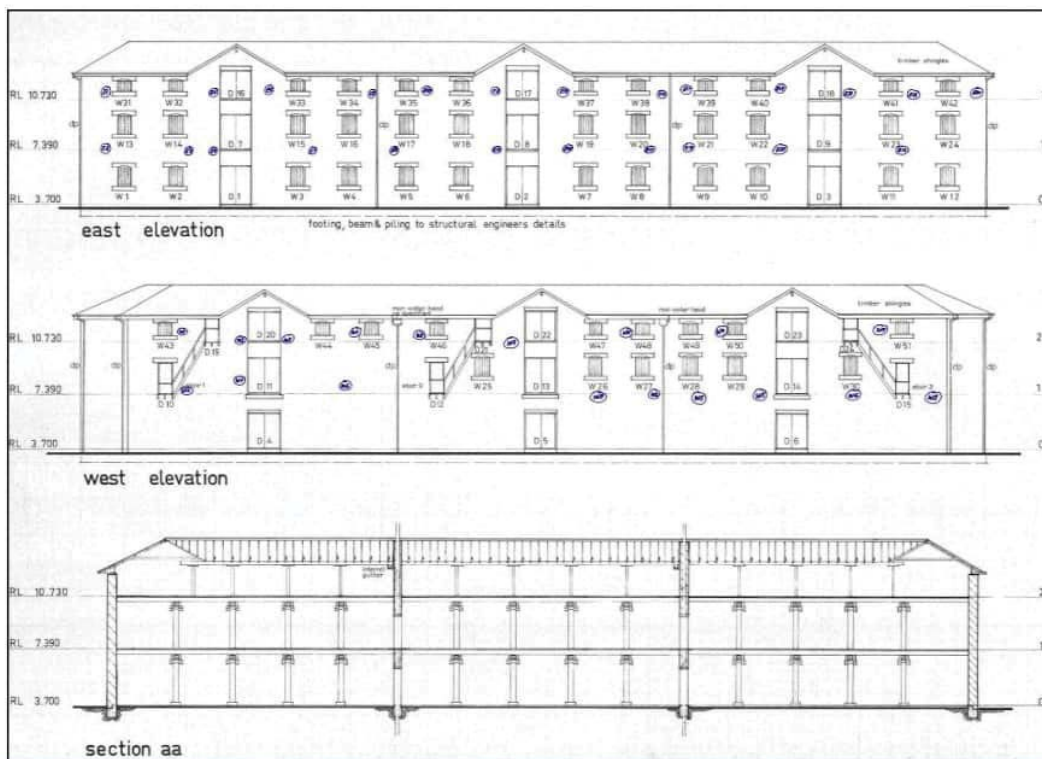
Extract of 1978 plan displaying the exterior elevations of Bay 1 of the Moore's Wharf building prior to relocation (Source: Historical plans provided by GroupGSA)
